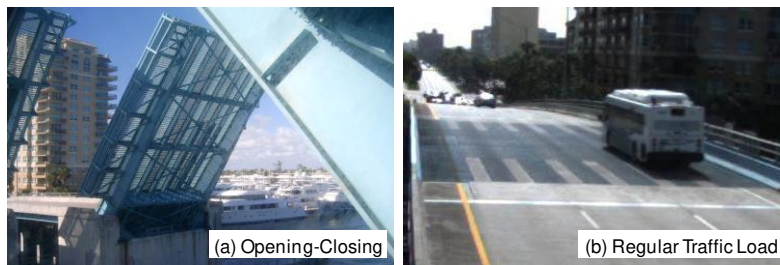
Uncontrolled testing of Sunrise Boulevard Bridge
